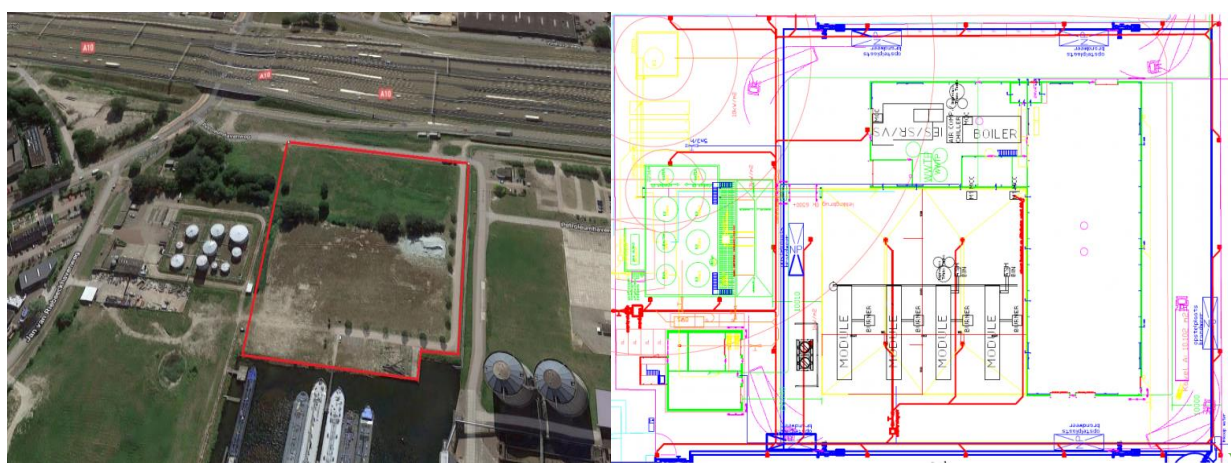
Site selection and construction planning of Bin2Barrel's plastic-to-oil plant
